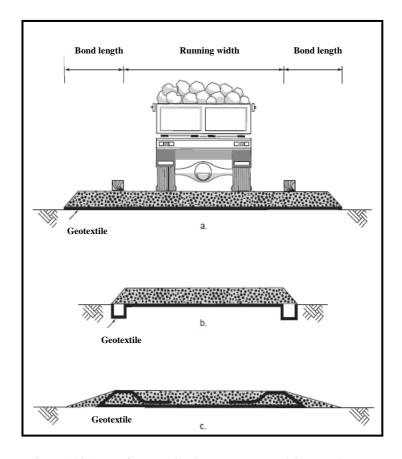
Use of geo Textiles in Temporary Road Construction.
